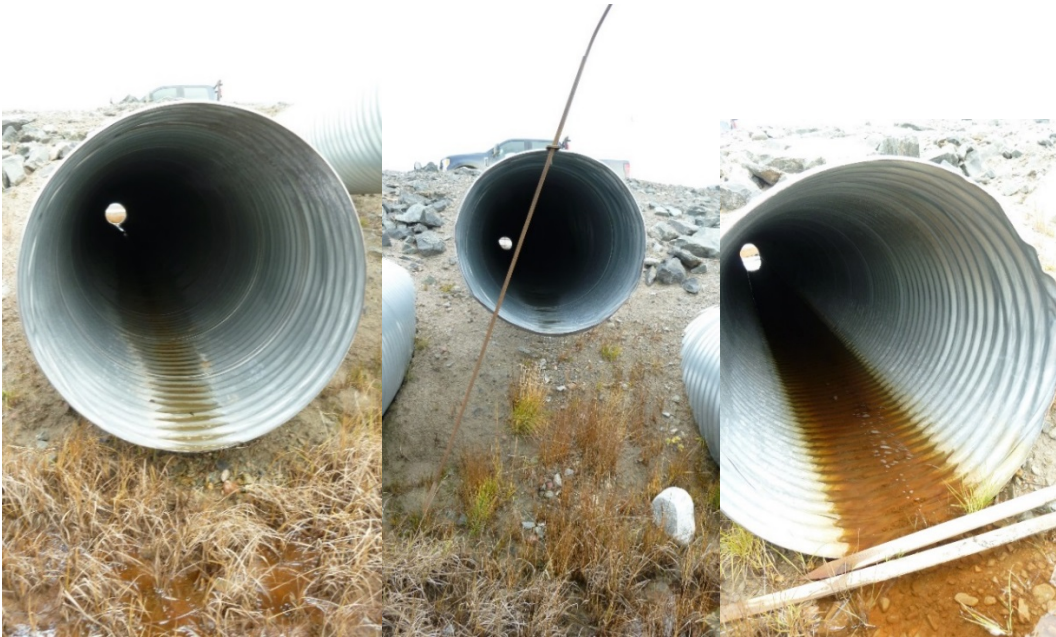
At KM7.0, Upstream Ends of 3 CSP Culverts. Vertically Offset. Lower Two Culverts are 1000 mm in Diameter and Upper Culvert is 700 mm in Diameter. Some Exposed Esker Sand, Additional Armouring should be Considered (20 September 2017)
